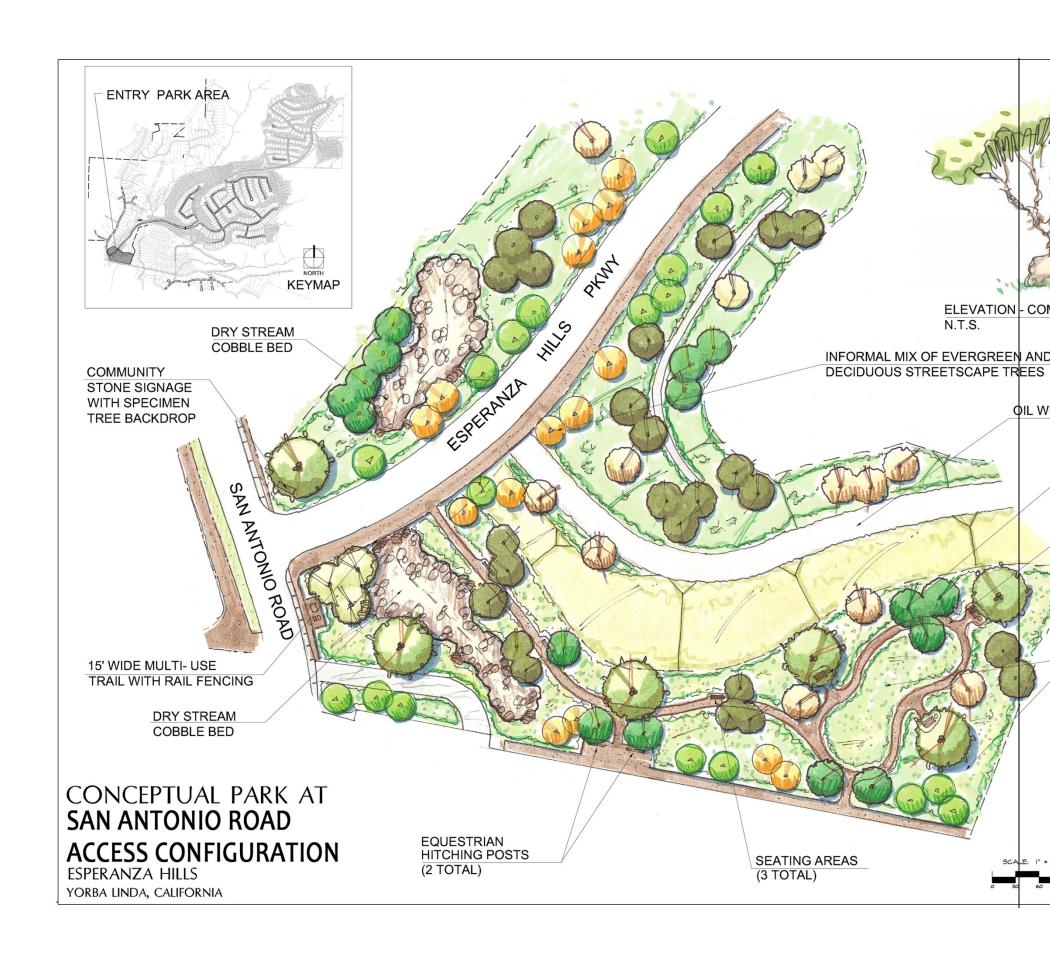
Exhibit 9 - Conceptual Park at, Entry Road, San Antonio Road Access Configuration Plan
